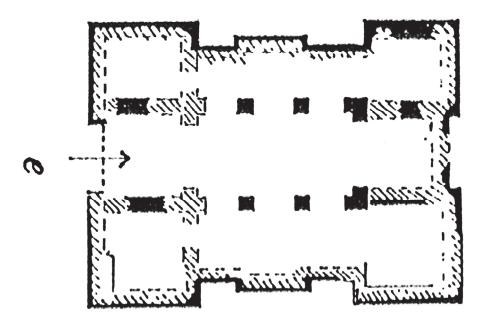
Church of Qoḥayto, Akkälä Guzay, Eritrea, floor plan; from Buxton, after Krencker
